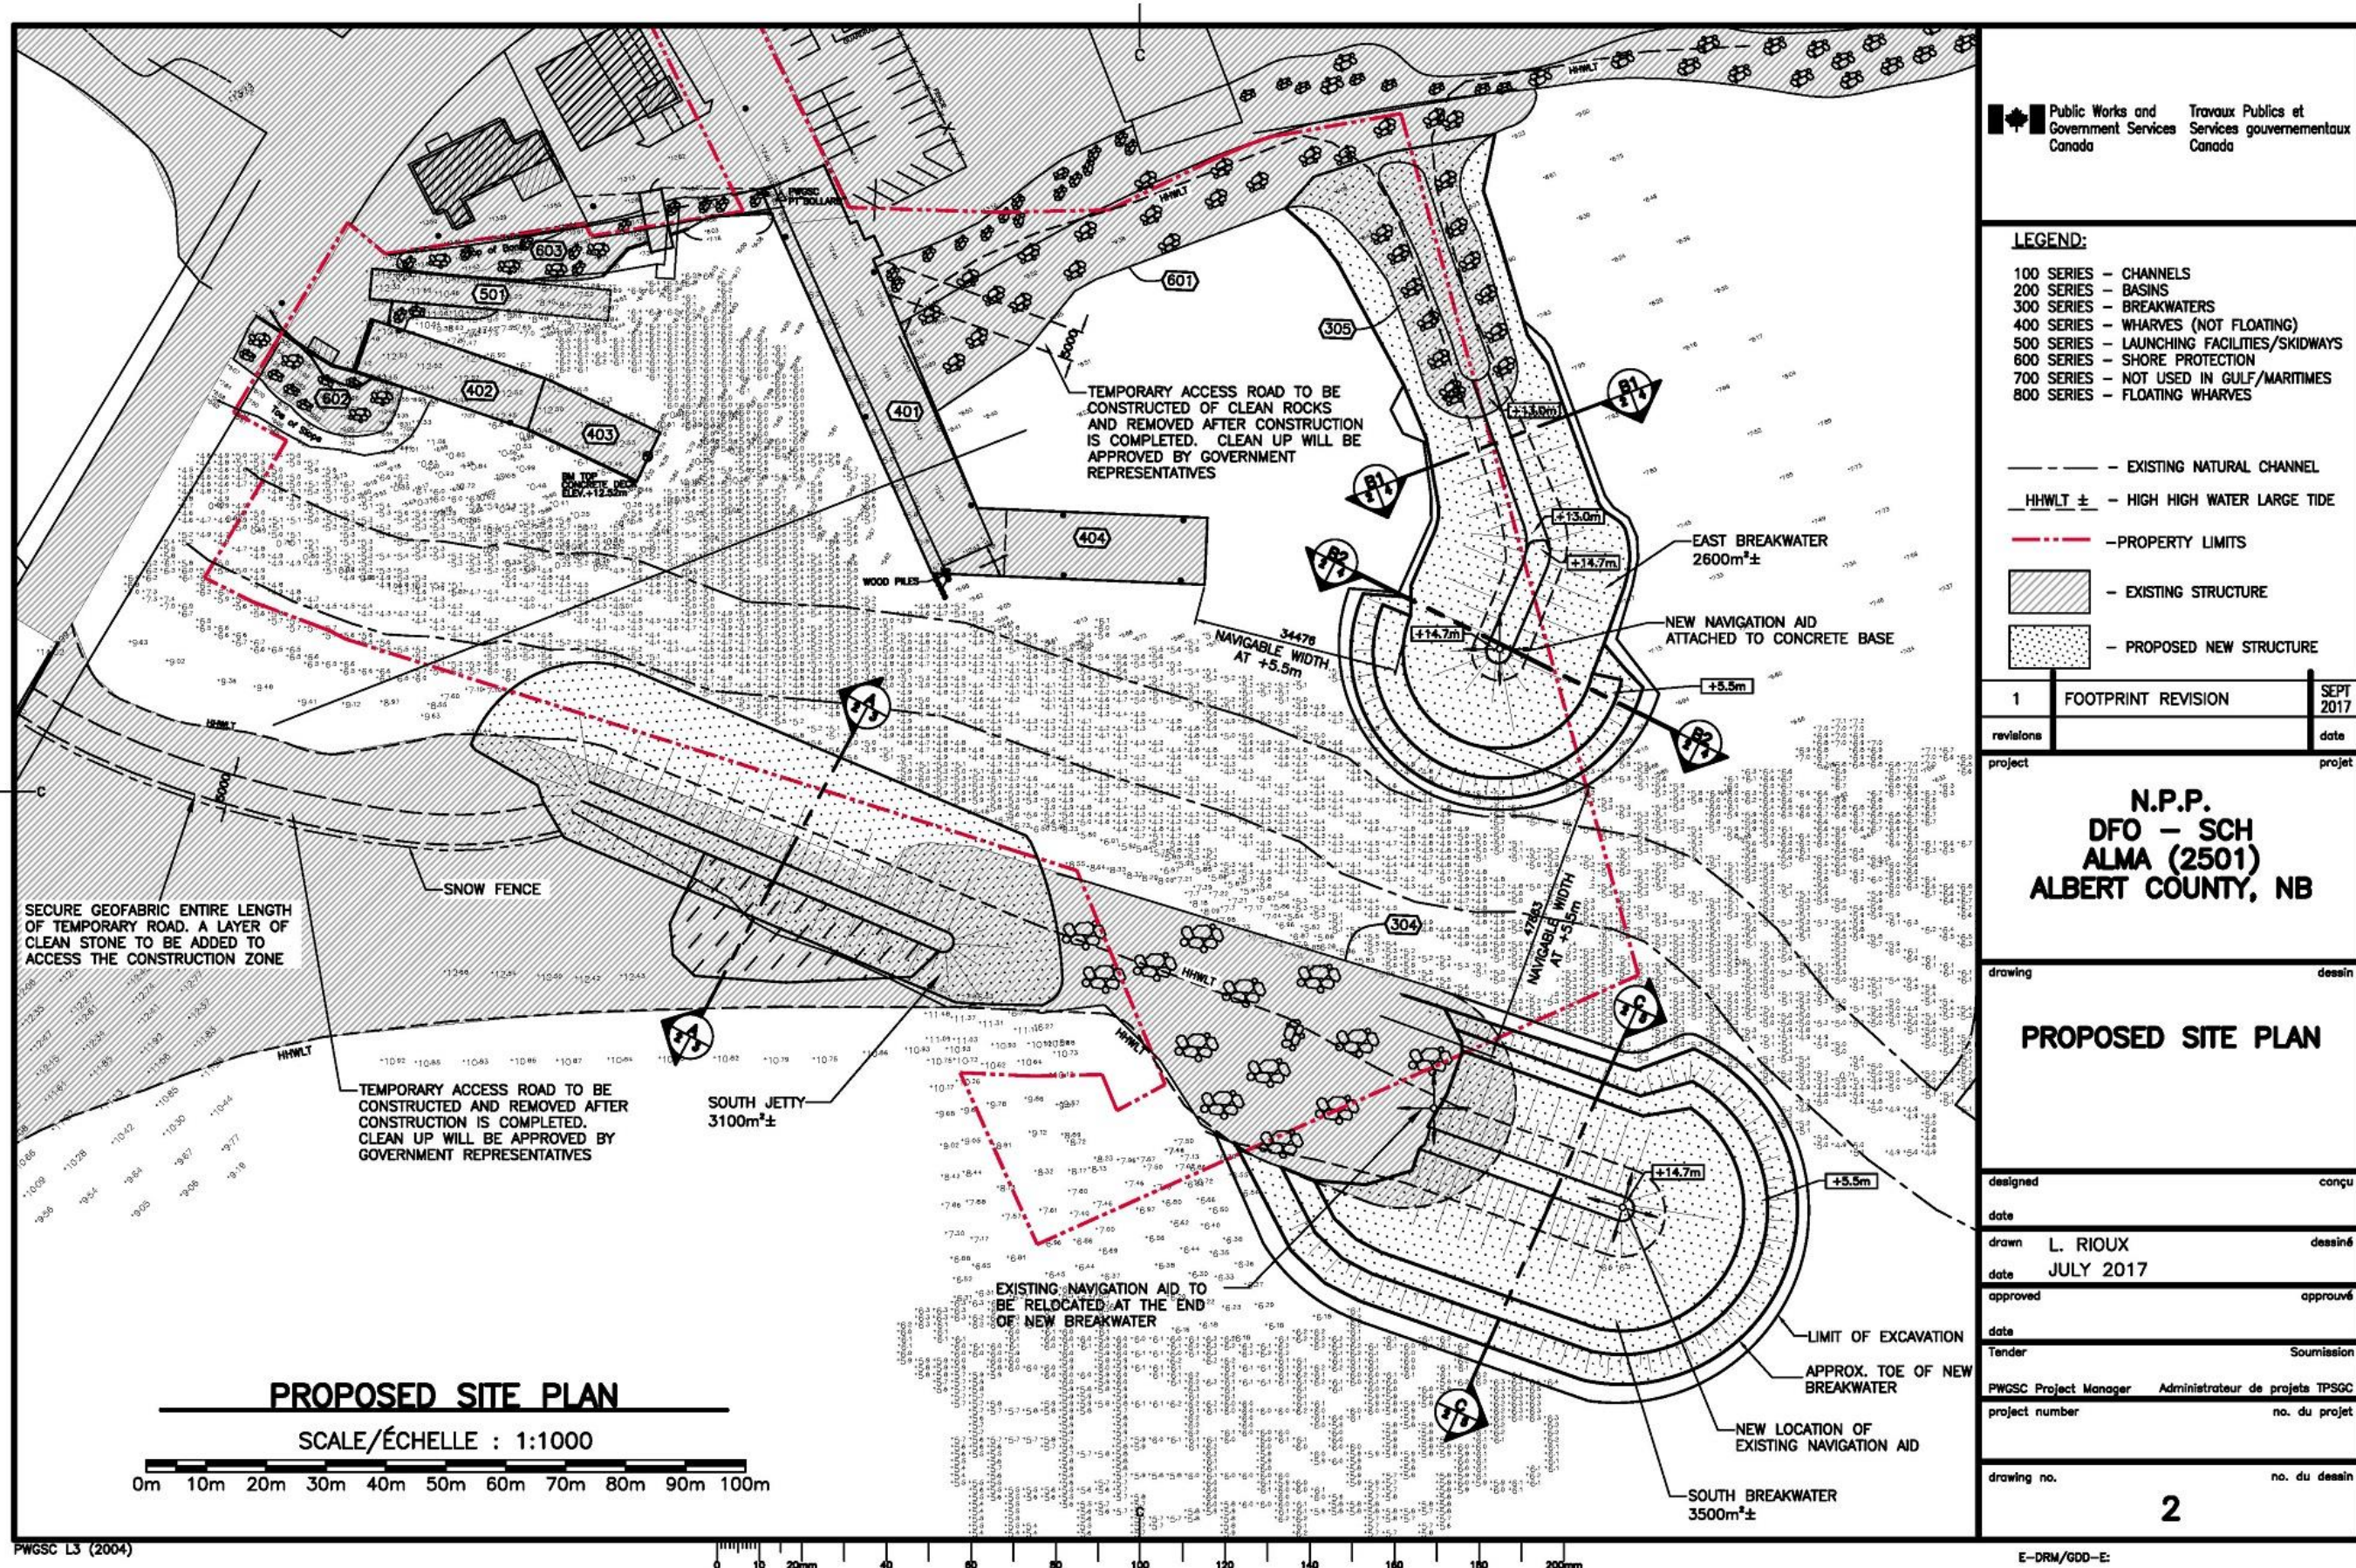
Site plan showing proposed breakwaters extensions at Alma DFO-SCH, Albert County, New Brunswick
